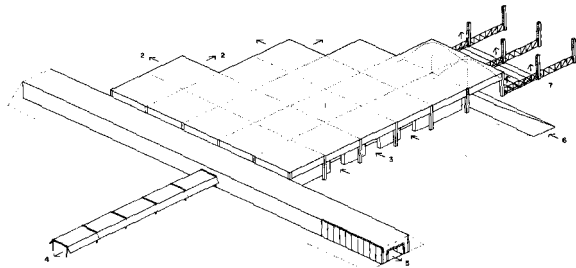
BASE CONCEPT 1. Flat shield raised in sections, pressurized enclosures beneath. Overall view of base. (1) Regolith shielding (2) Perimeter expansion (3) Base entry through overlapping radiation border wall; from lunar surface equipment and installations 'park' (4) Solar shaded links to other parts of base. (5) Shielded links to other parts of base. (6) Ramp access to lower levels (7) Initial erection sequence.
